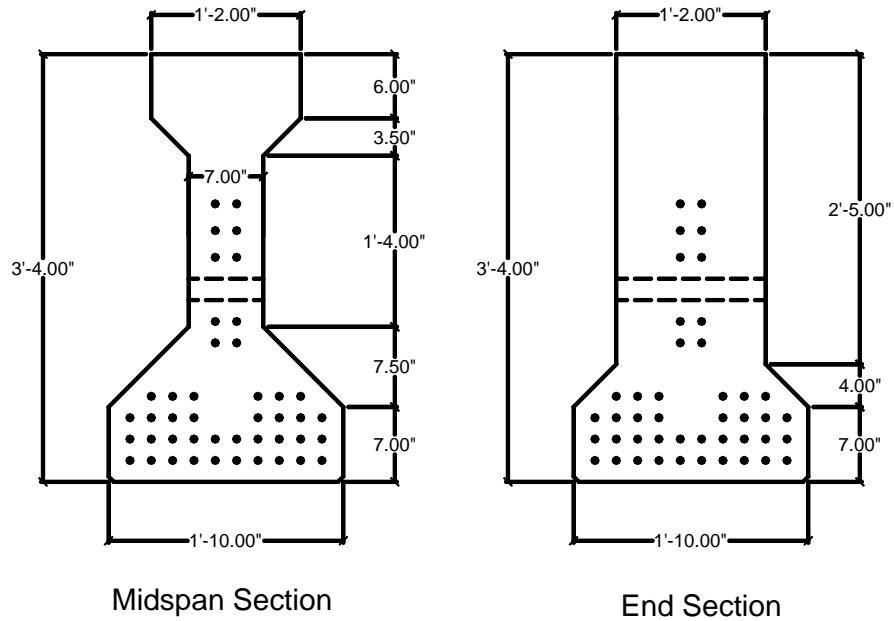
Type C Girders – Lake LBJ Bridge
